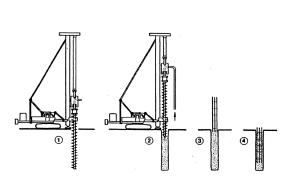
Installation method for augered concrete piles *[van Tol, 2006]
